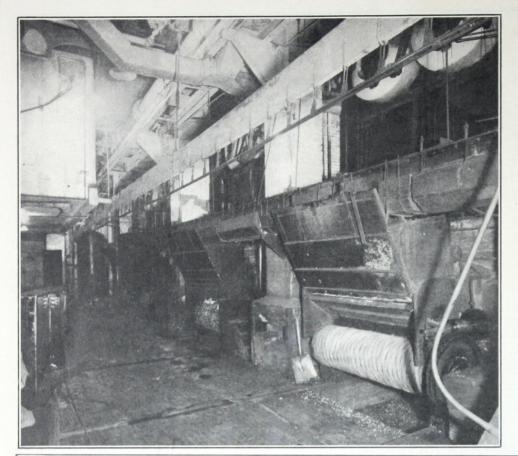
Former Boiler Room of 24-Story Bank and Office Building. Showing Four 250hp Boilers
